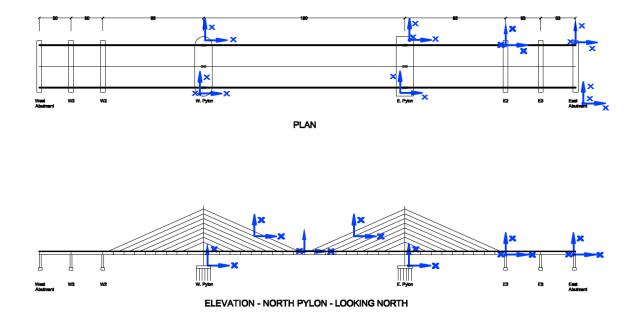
Example of Bridge Instrumentation (Pitt River Bridge Sensor Locations)
